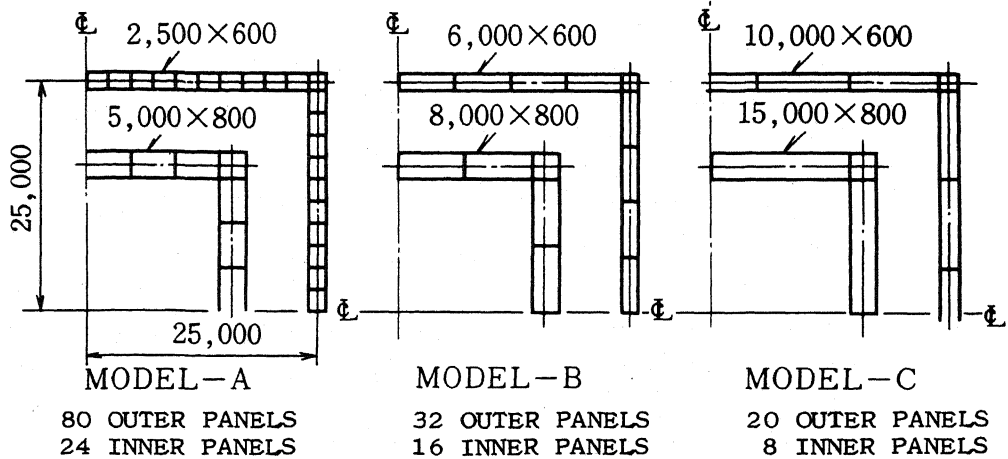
PILE FOUNDATION PART OF EACH WFS
